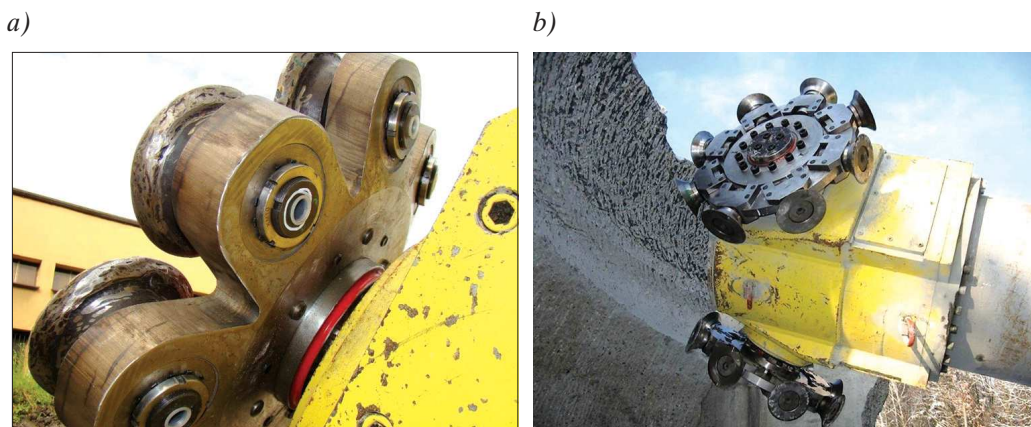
View of: a) modified solution of plate with disk tools mounted at -5° angle; b) new universal solution of plate with disk tools mounted in interchangeable holders at 90° angle [2]
